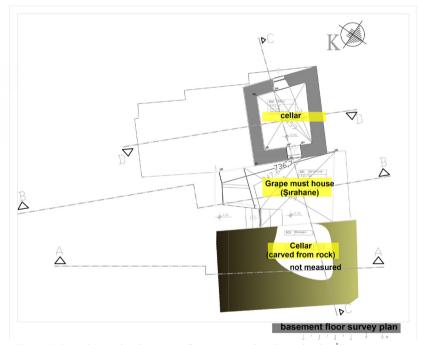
Oral Mansion basement floor survey plan (Drawing by İlknur Acar Ata)
